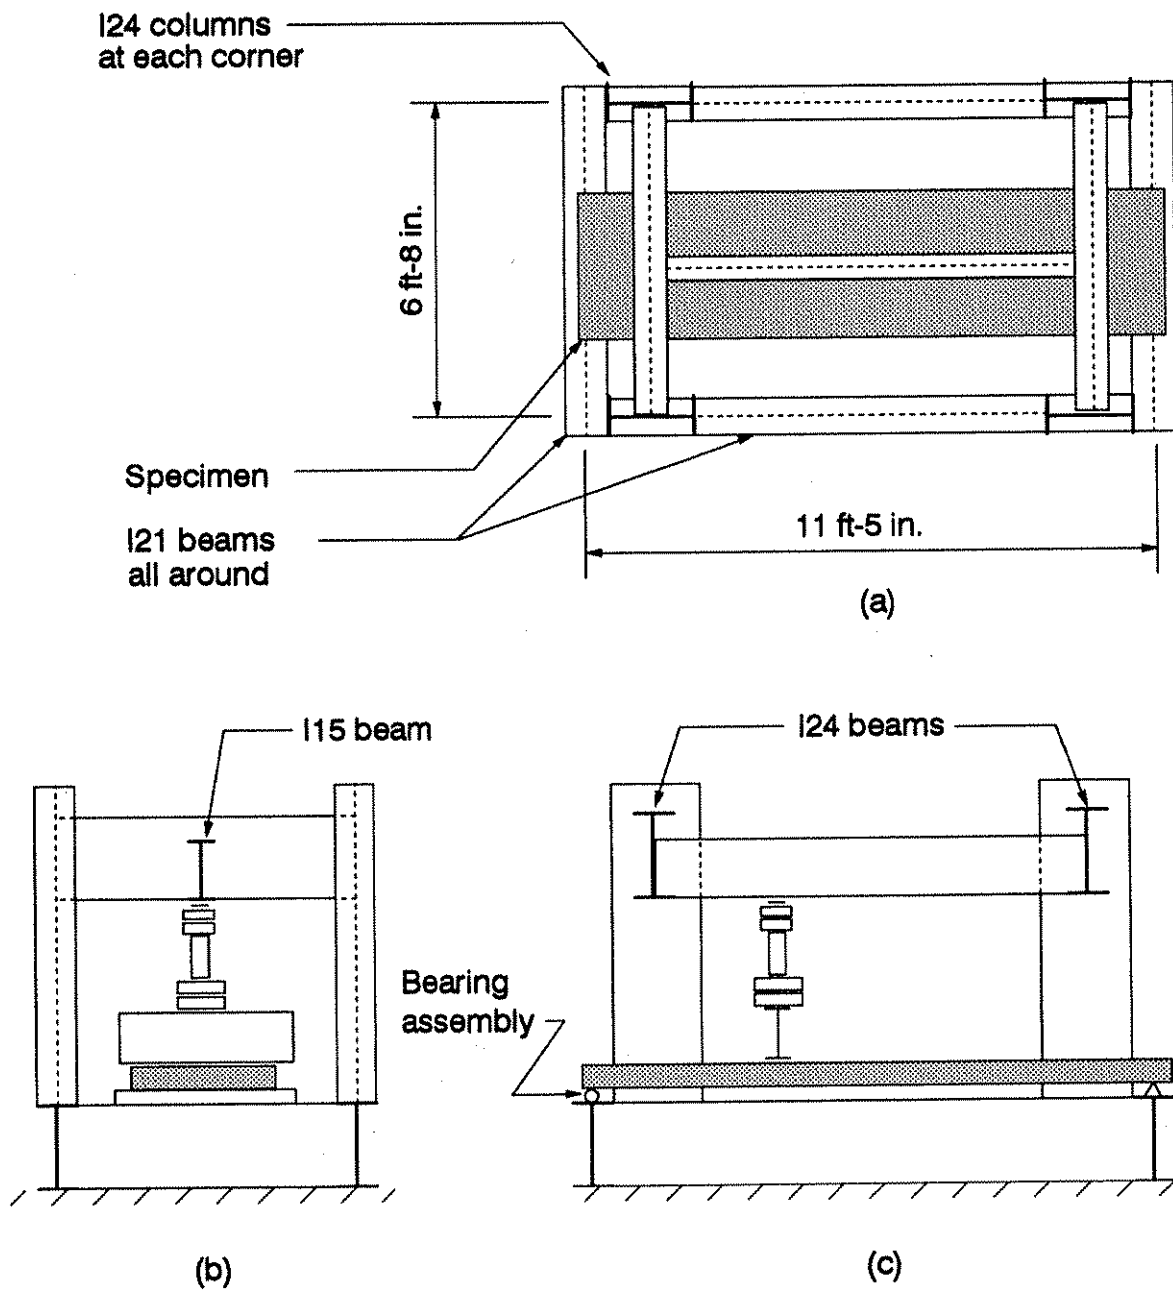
Development length test frame: (a) plan view; (b) transverse section; (c) longitudinal section
